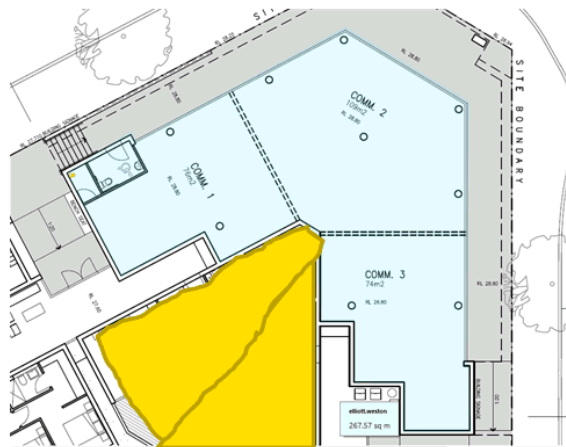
Extract of Ground floor plan with the gross floor area of the commercial tenancies highlighted in blue with the floor area indicated. (yellow is a redaction of the internal floorplans of units).
